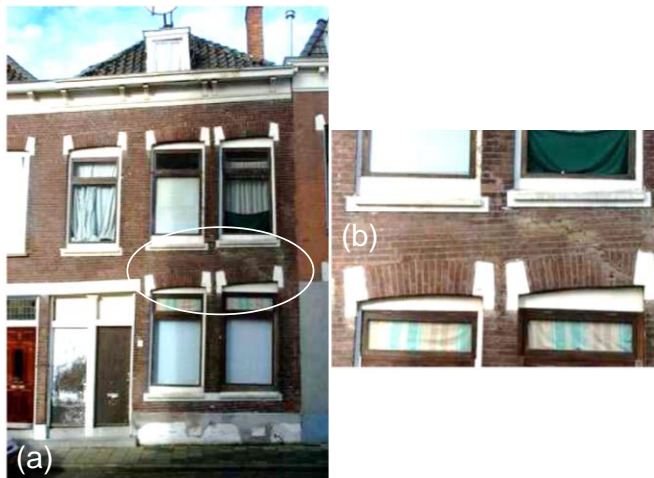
(a) Dutch house showing differential settlements (more than 20 cm) between right and left wall causing (b) cracks in the wall and structural damage to the house (Adaptation from [145]).
